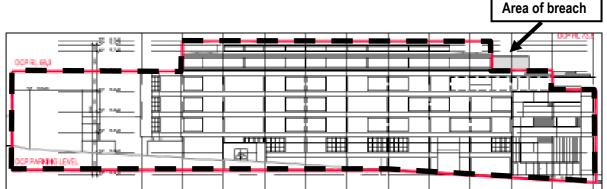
Dotted outline illustrates permissible envelope under DCP and grey shaded area represents breach of envelope for Building F
